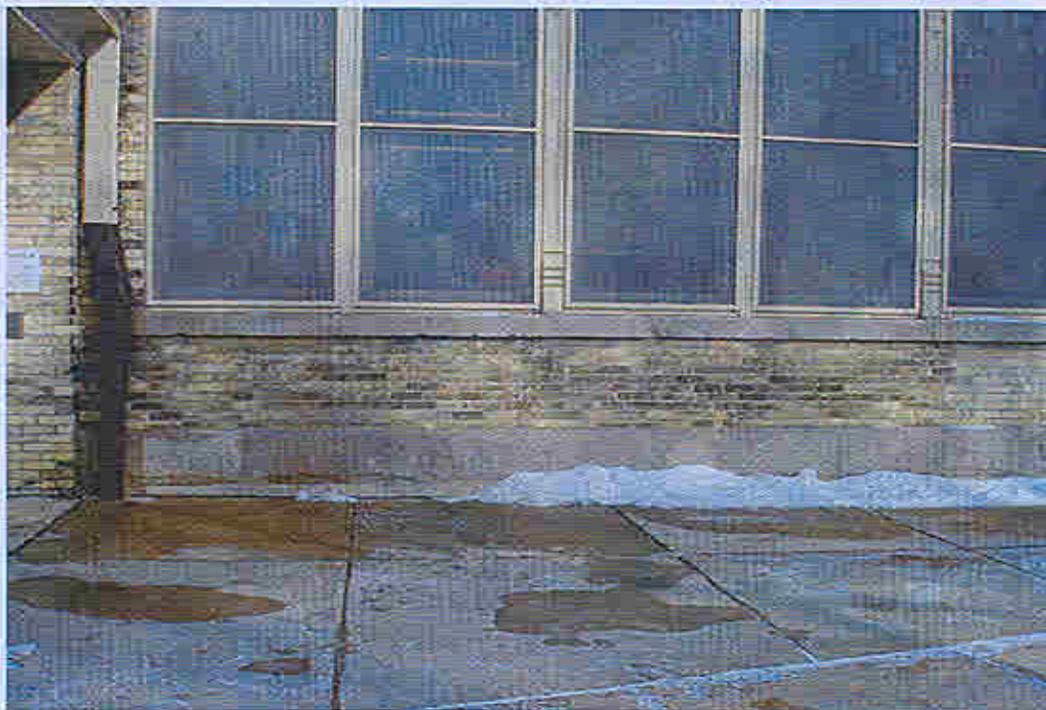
Damaged brick and stone at south elevation from leaking downspout would be replaced
